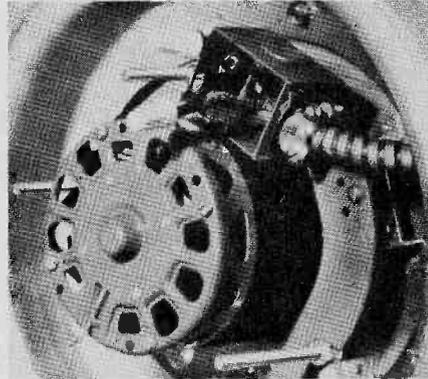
Here is a close-up of the fan motor and electrical connections. BX cable comes from house wiring and connects to an electrical box mounted on the motor. Wire nuts cover the splices.
